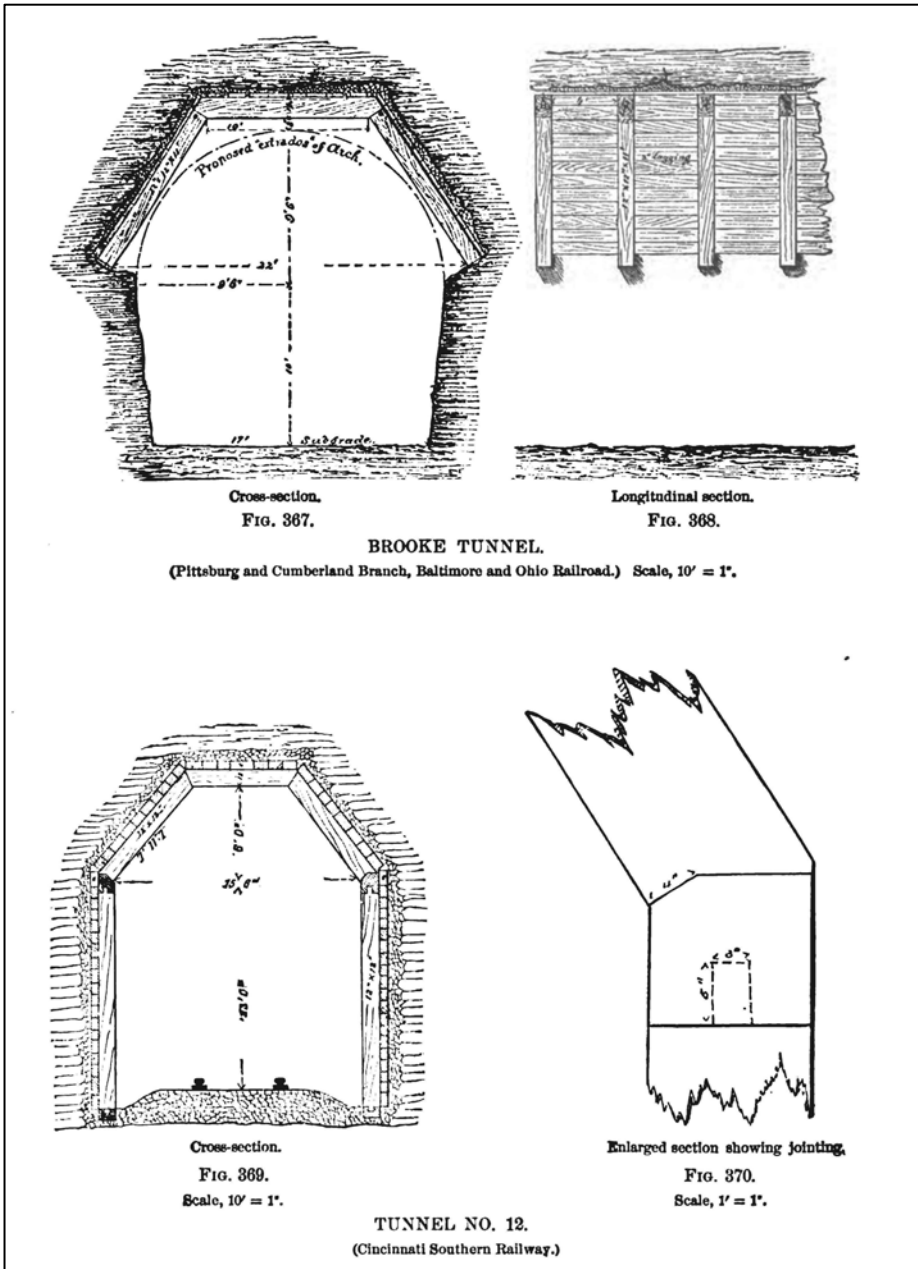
Section drawings illustrating timber lining techniques used in railroad tunnel construction; note an example of Cincinnati Southern Railway Tunnel No. 12 (Drinker 1893:568).
